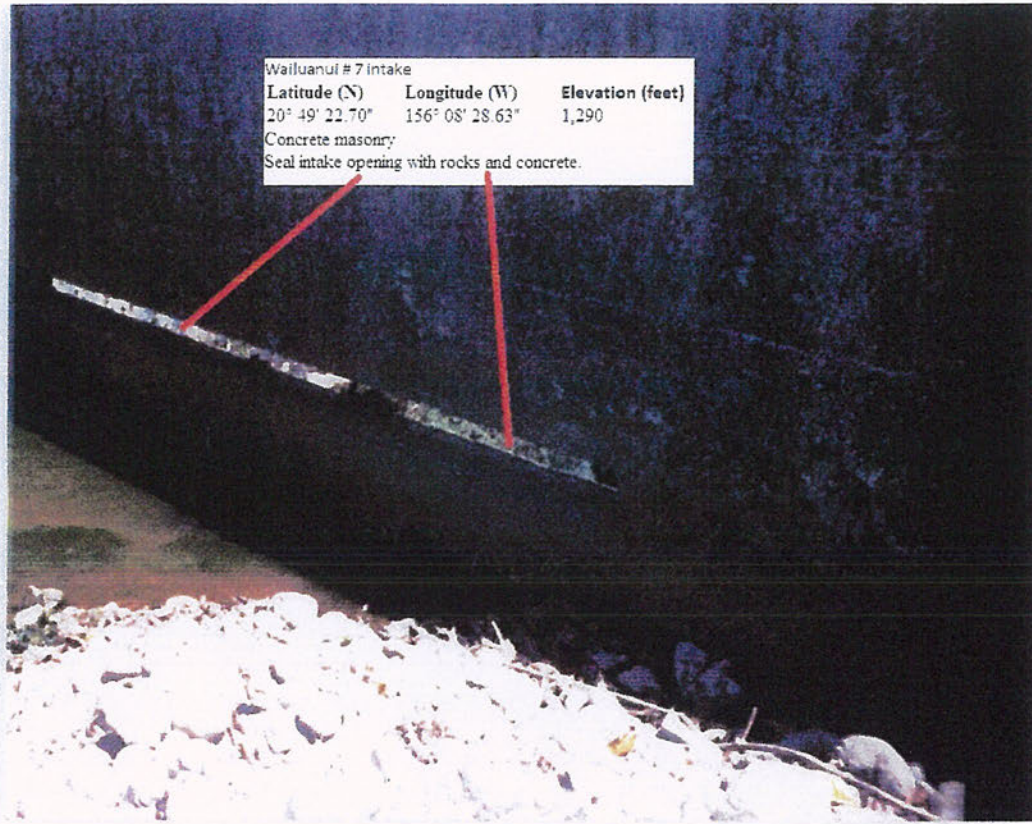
(above): Wailuanui #7 intake at Koolau Ditch (K-20)
